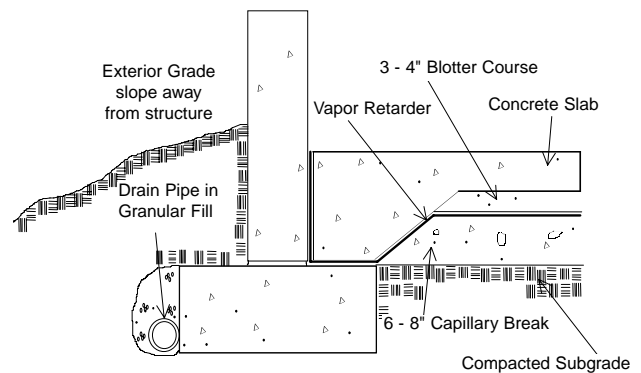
Typical Detail of Slab on Grade with Vapor Retarder
